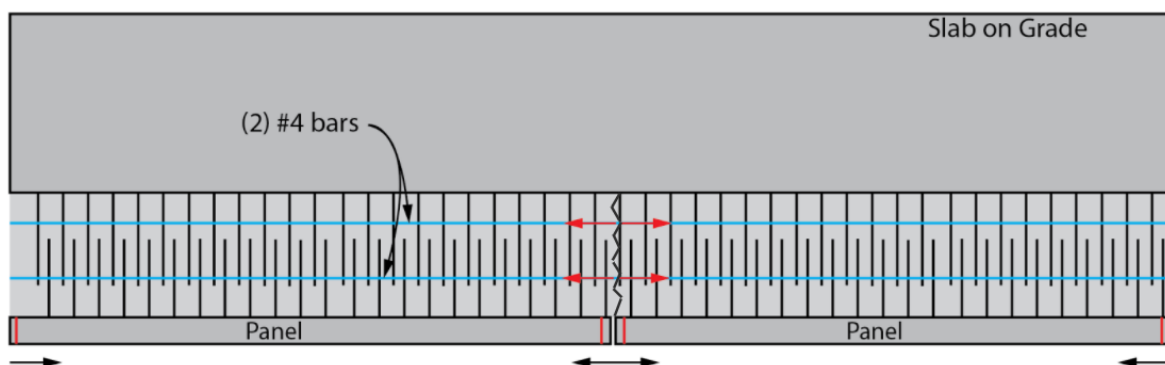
FBD of Pour Strip Shrinkage Restraint
